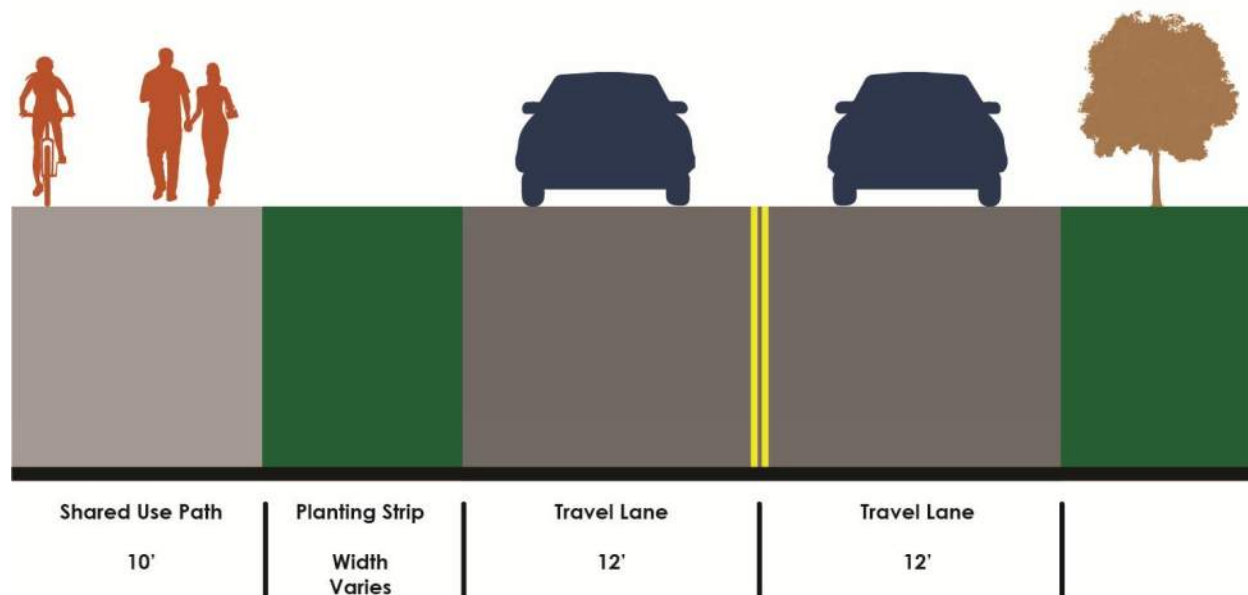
Old US Hwy 70 Typical Section – Recommended preferred alignment on the north side of the street
